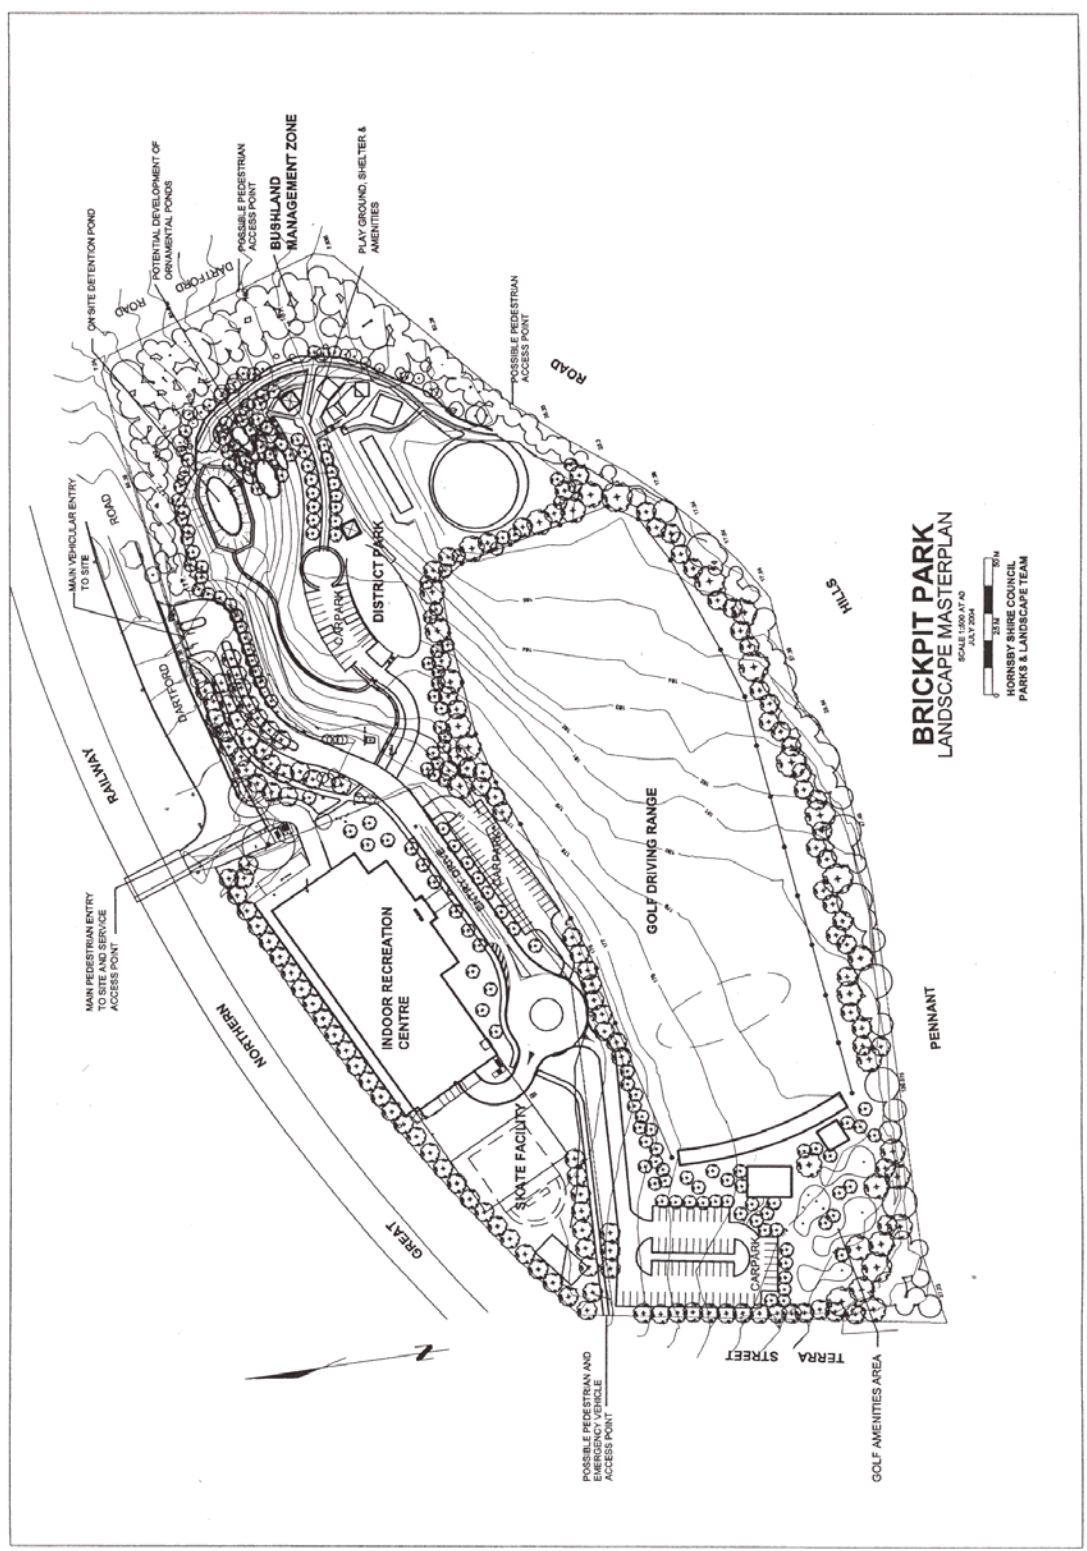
Landscape Masterplan for Brickpit Park showing proposed and existing facilities
